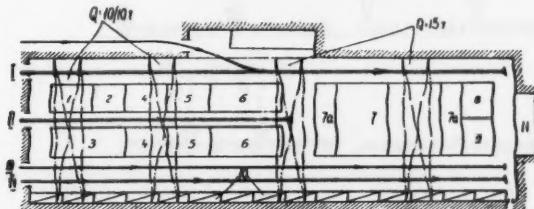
Schematic diagram showing the layout of railroad tracks, bunkers, and bins in the stock yard.
